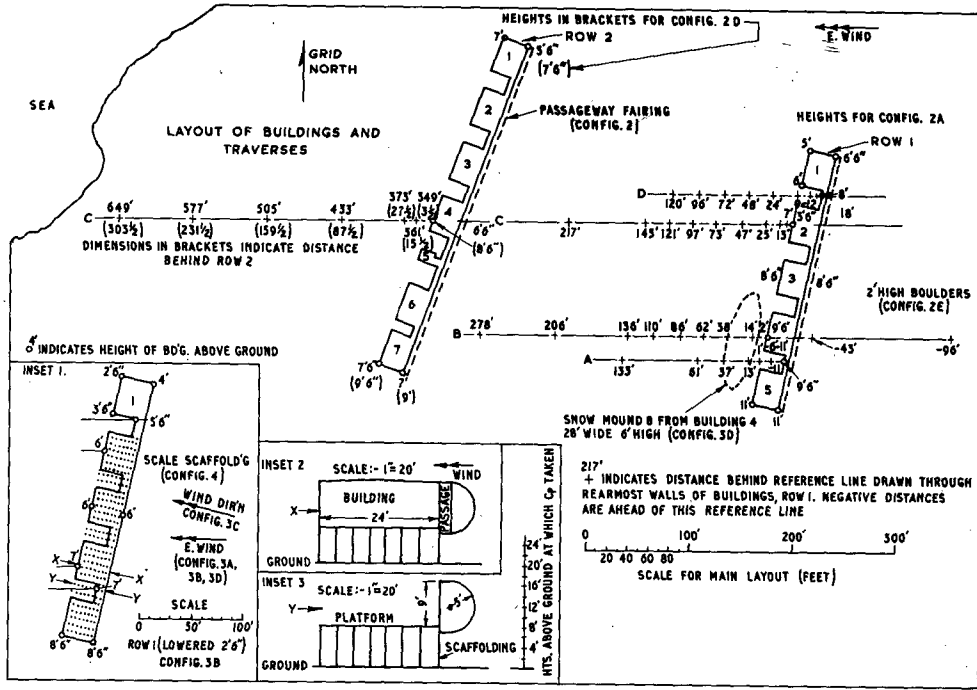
Details of main building configurations tested in the large wind tunnel.
